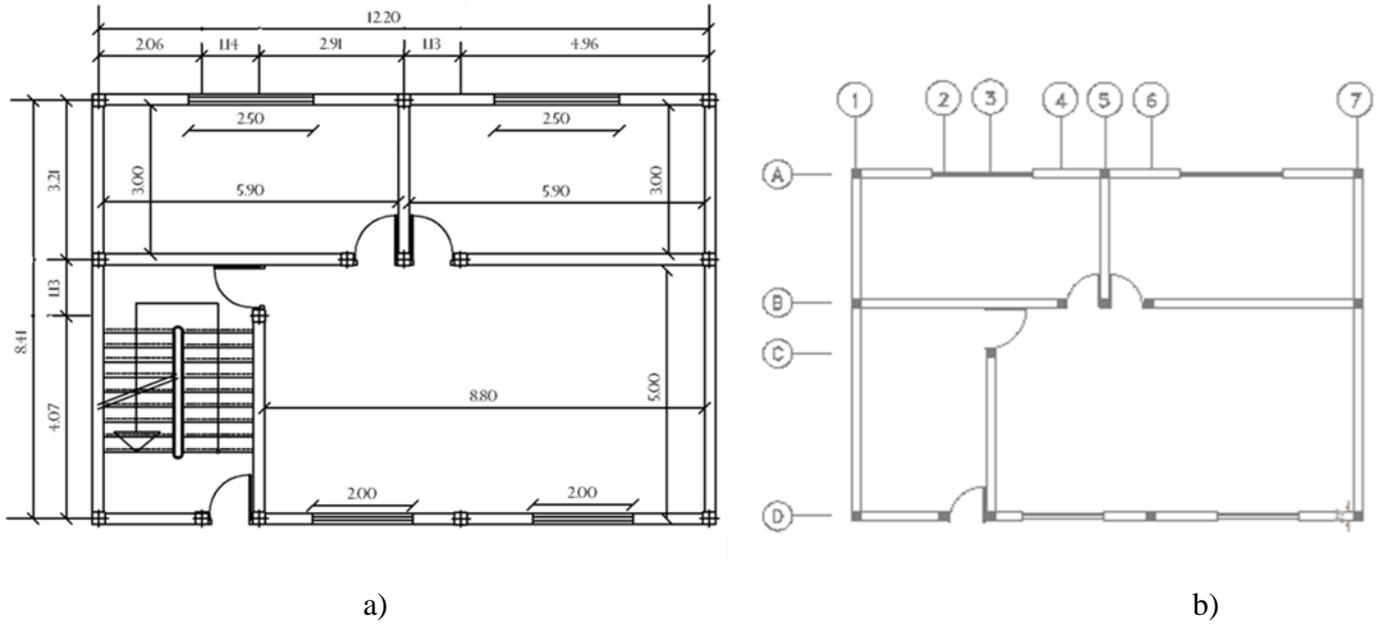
Prototype structure: a) With Dimension, b) With Center Line
